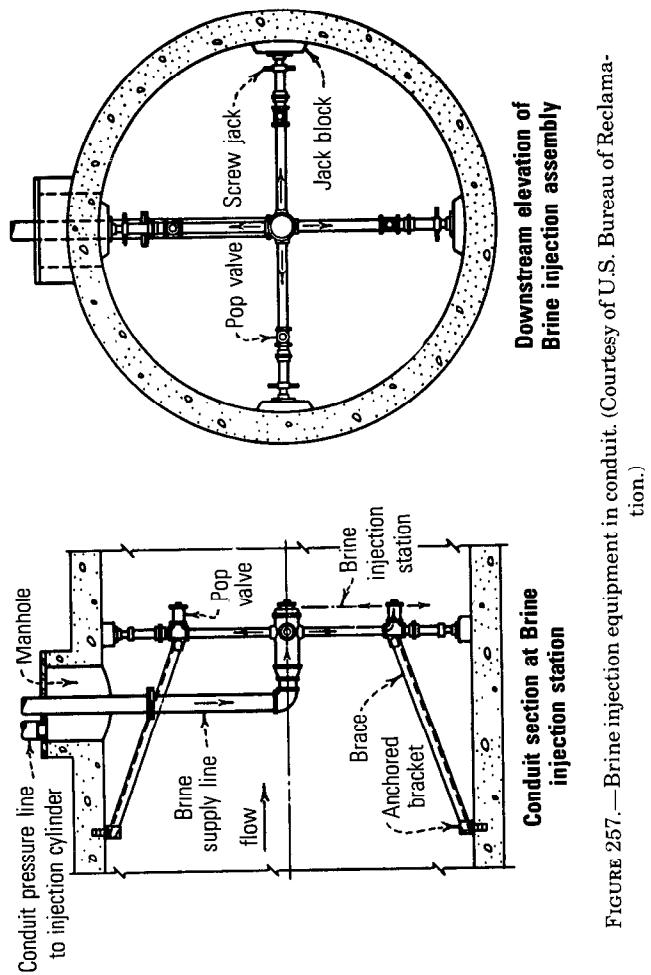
Brine injection equipment in conduit. (Courtesy of U.S. Bureau of Reclamation.)
